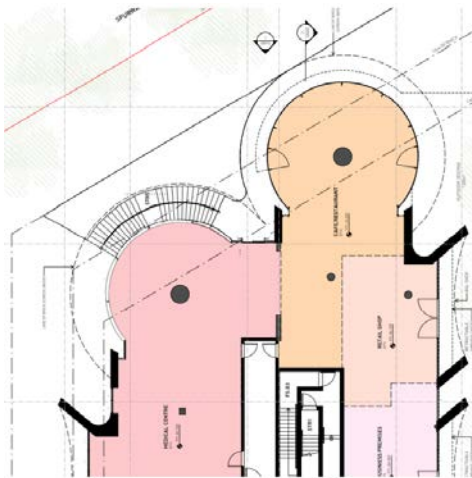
and 7: Building B Level 1 Plan and Western Elevation indicating encroachment to Spurway Drive setback
